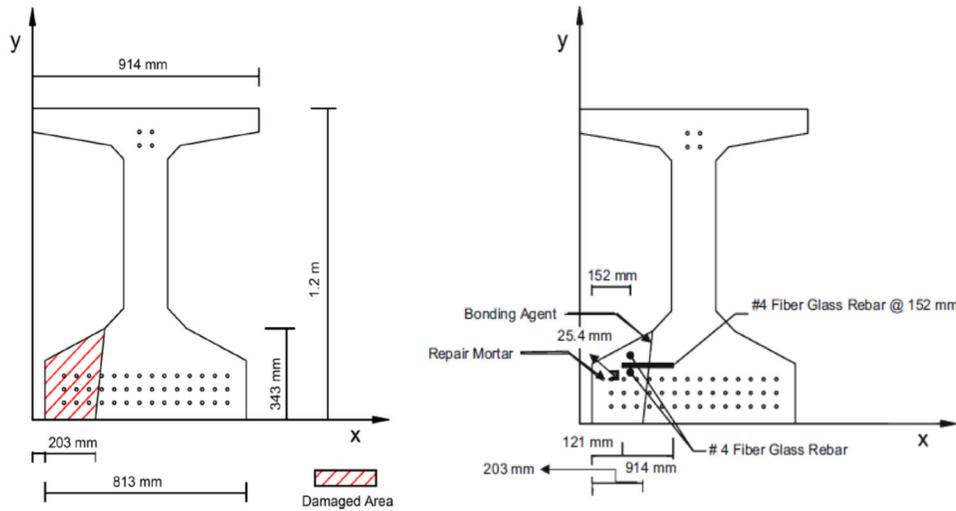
Repair approach for an impact damaged girder in Dallas, Texas [3]
